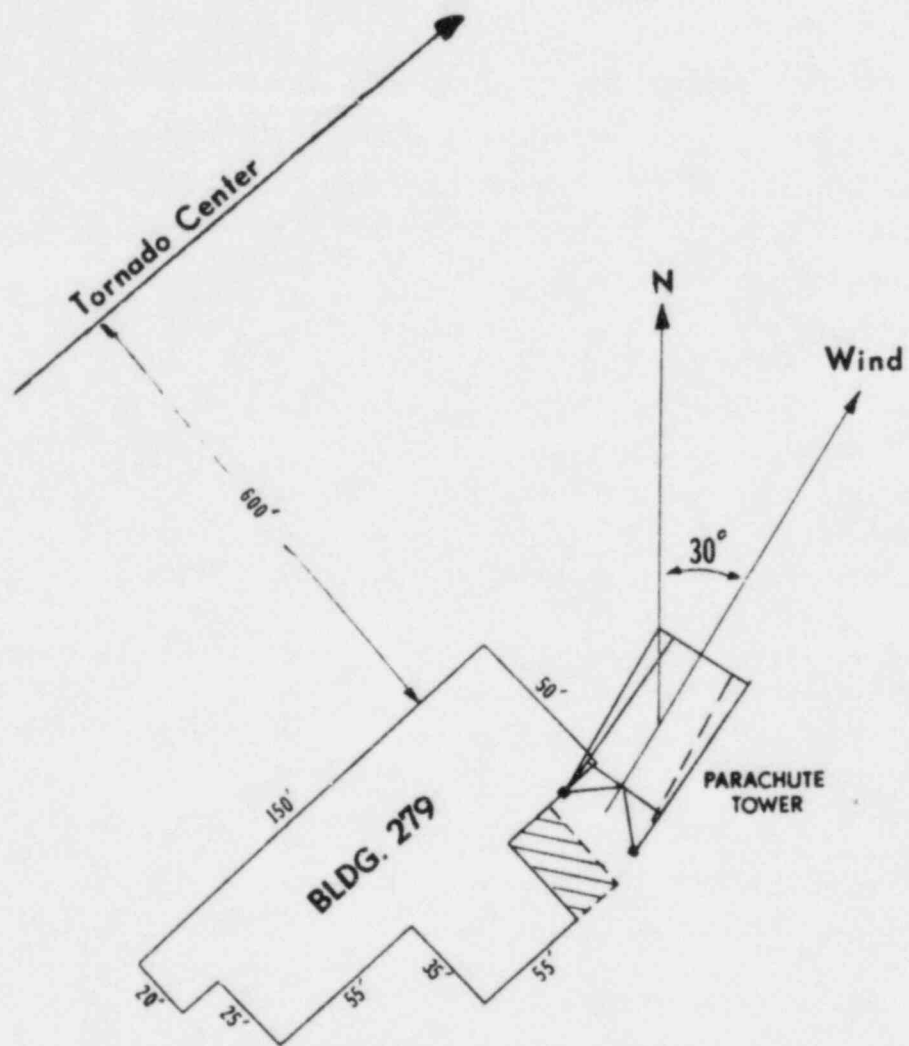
Plan view of the Parachute Drying Tower and Building 279.
